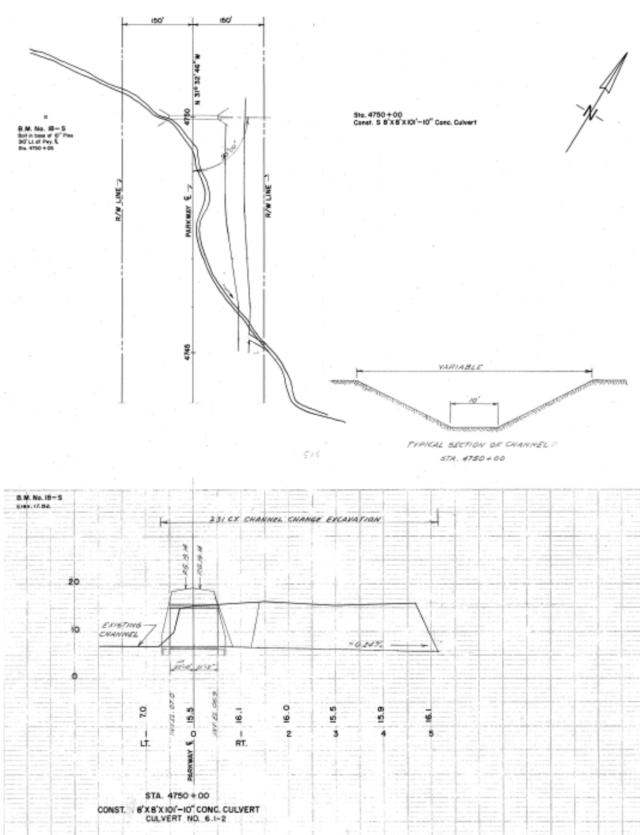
Plan/Profile Drainage Structure 6.1-2 - 1955 plans
